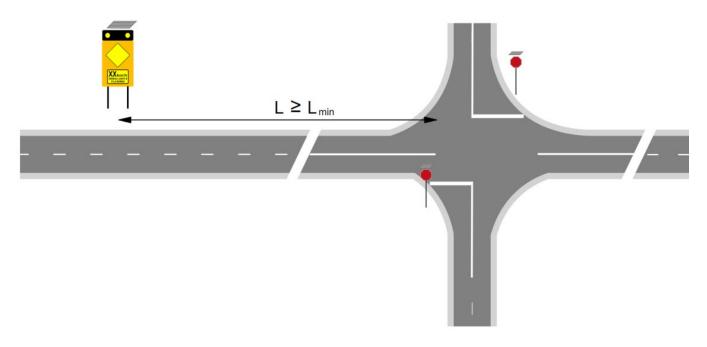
The major road speed advisory sign should be placed at a distance (L) from the intersection.
